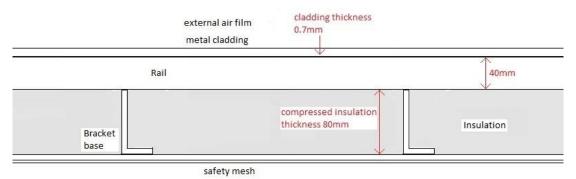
TYPICAL LOOSE MESH CONSTRUCTION - SIDE VIEW
